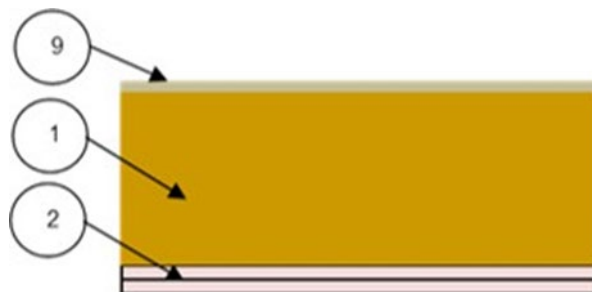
Timber framed floor ceiling system with fire grade lining fixed directly to the joist – Section view
